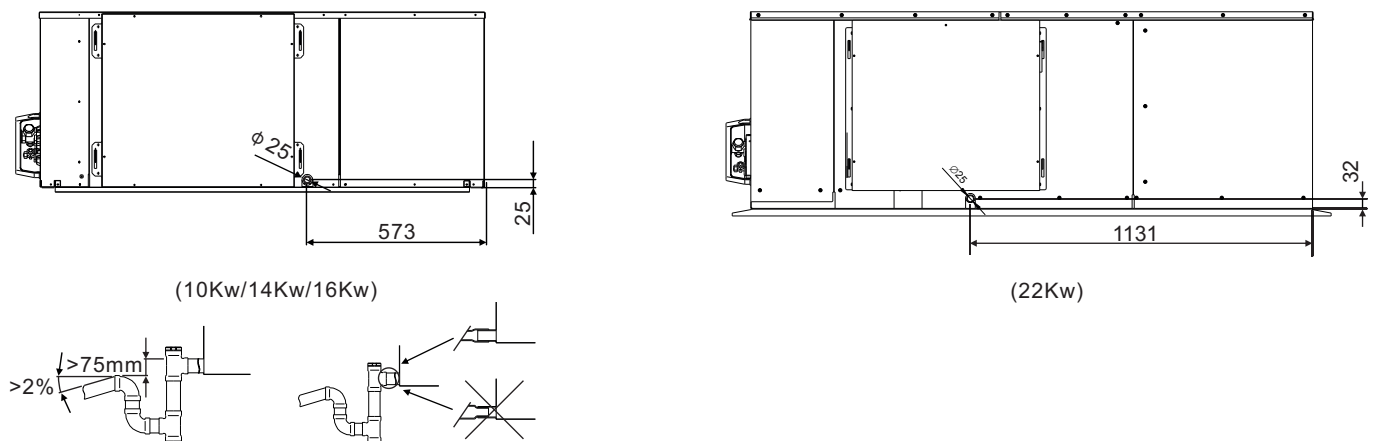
Schematic diagram for connecting pipe of outdoor unit
